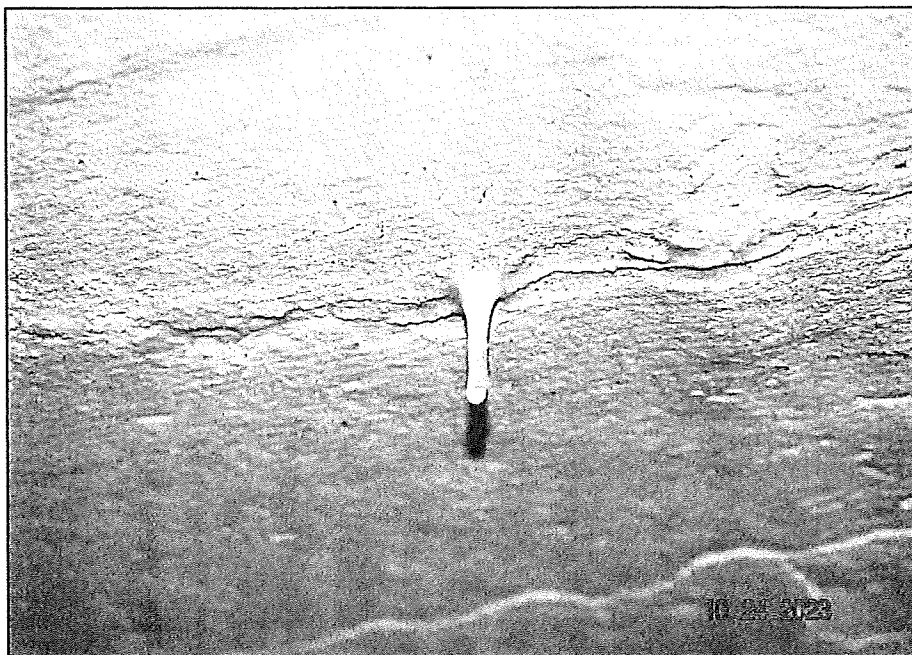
Representative calthemite deposit at roof slab crack.
